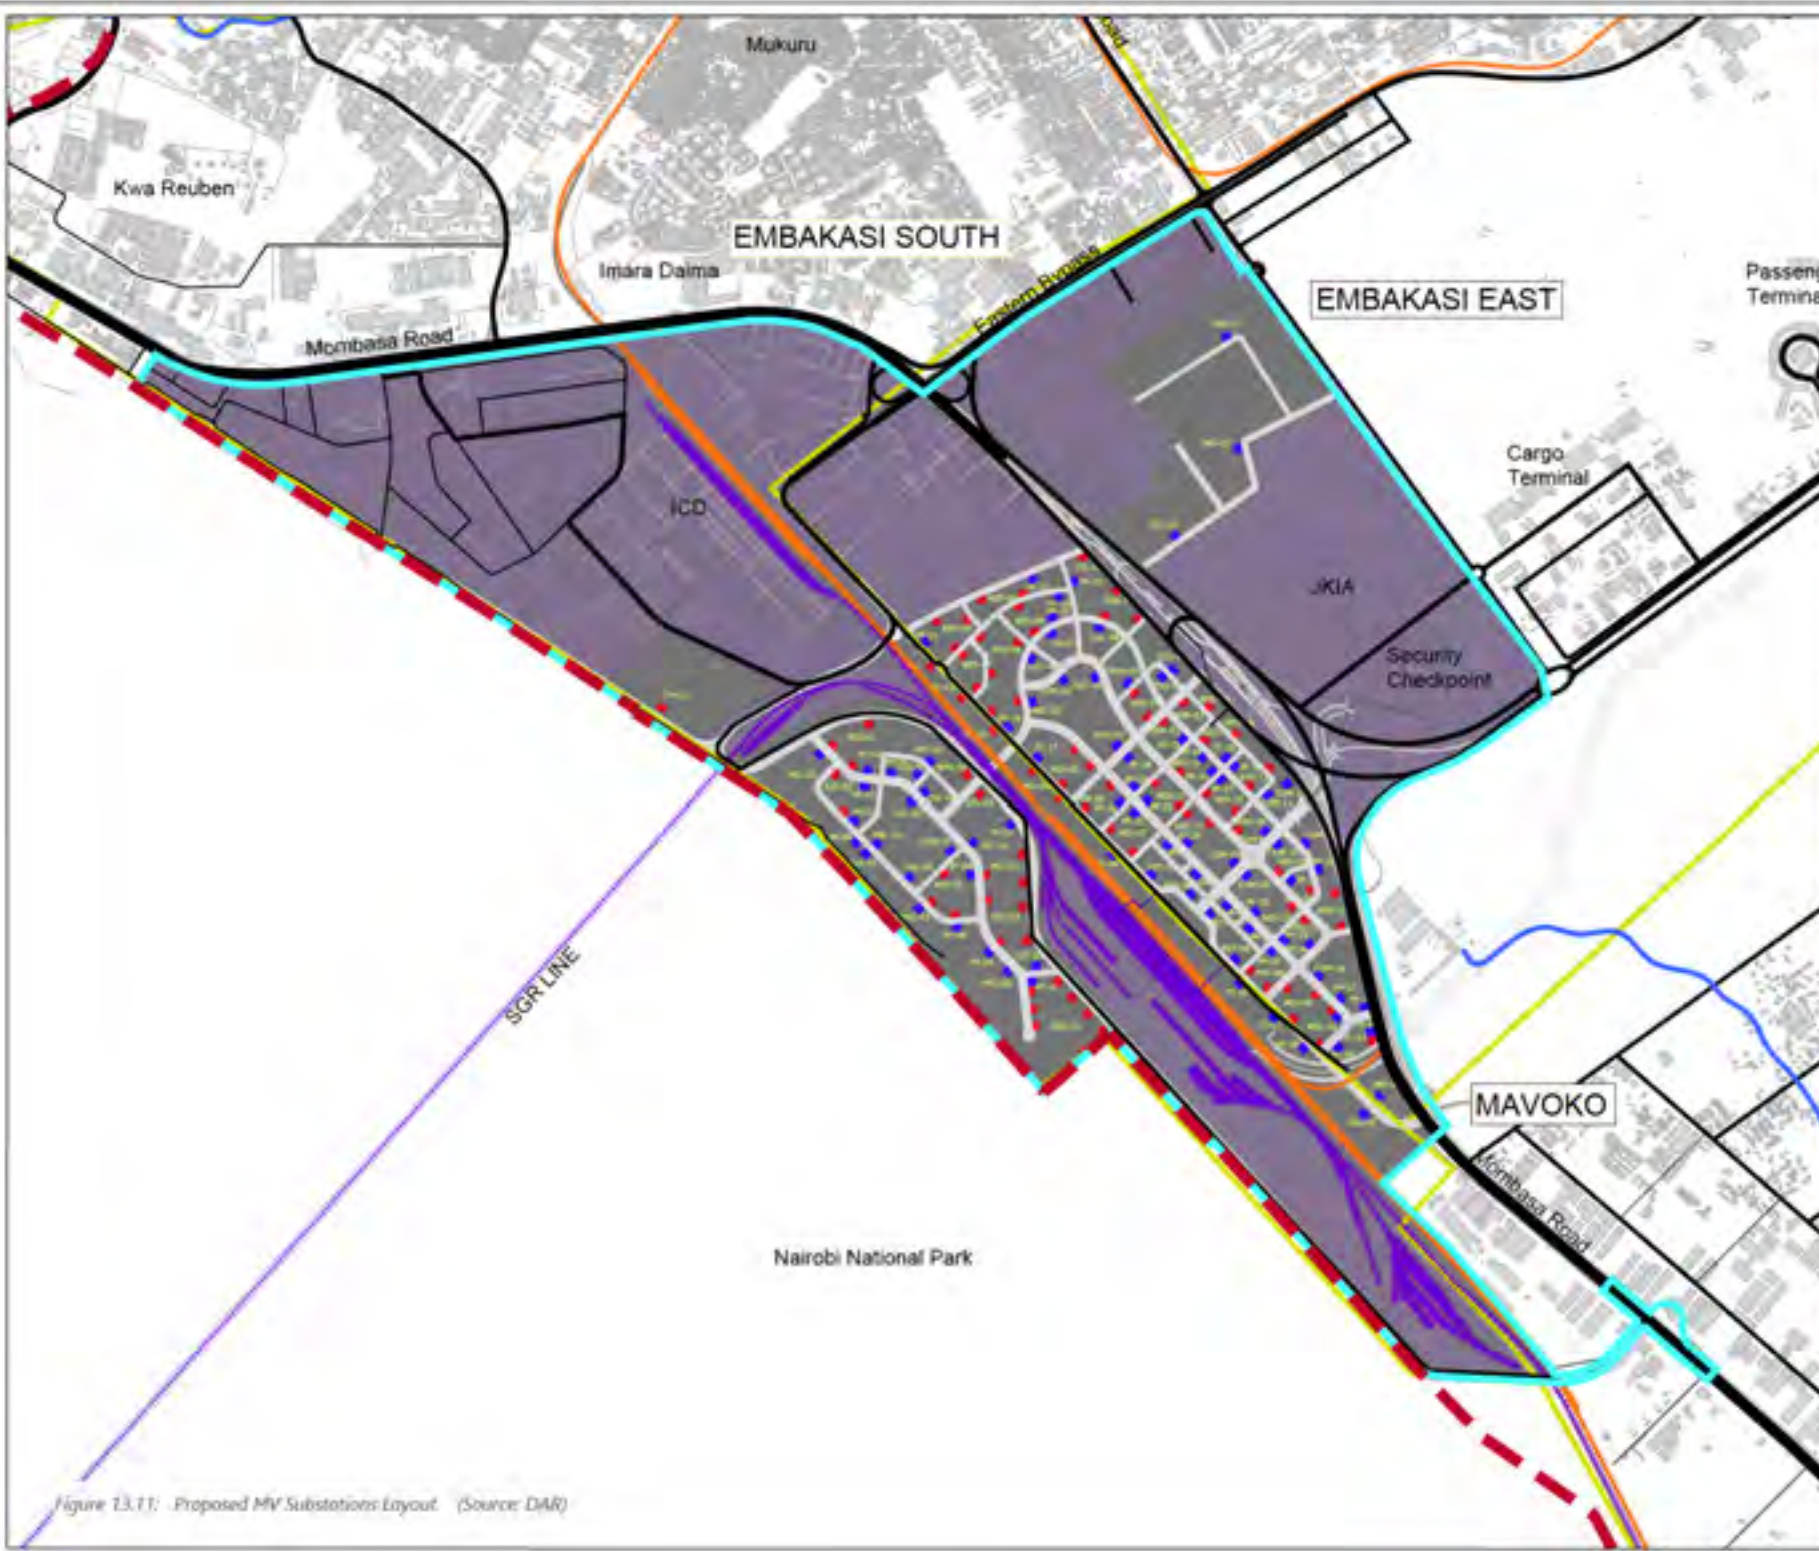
Proposed MV Substations Layout (Source: DAR)
